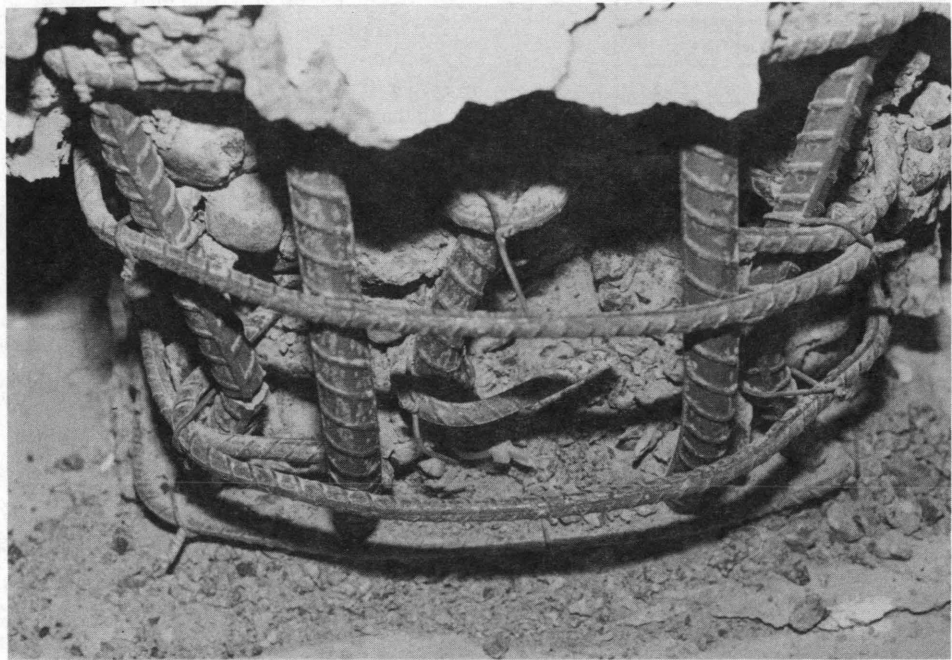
Buckling of longitudinal reinforcement in Column 6.
